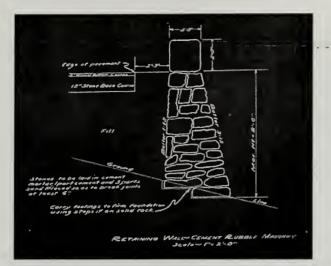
Detail of a guardwall/retaining wall from Kebo Mountain Road, 1936. (U.S. Department of Agriculture, Bureau of Public Roads, Project 6A1, Sheet 13 of 14, 1936)
